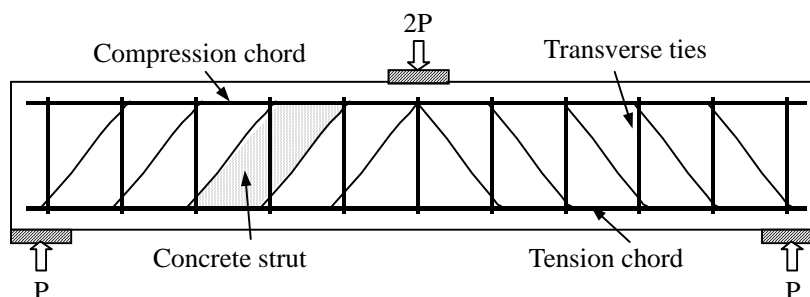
Truss model analogy for reinforced concrete beams under shear [V2]
